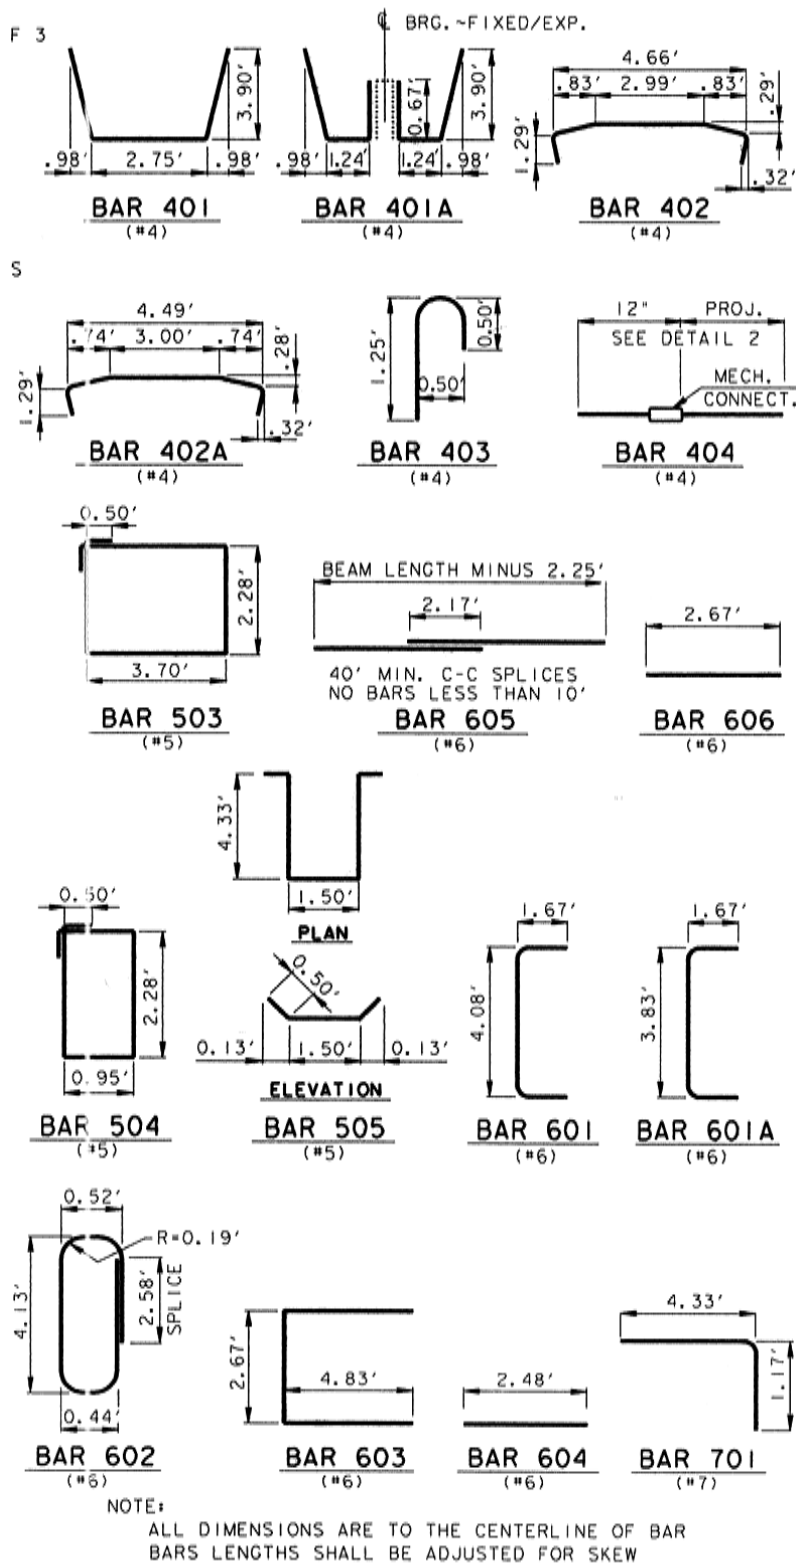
Dapped end reinforcing bars for 54" prestressed trapezoidal box beam.
